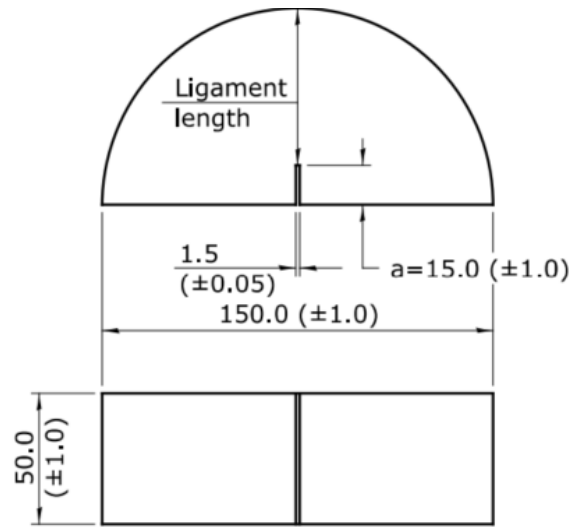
I-FIT specimen dimensions; all in millimeters [5].
